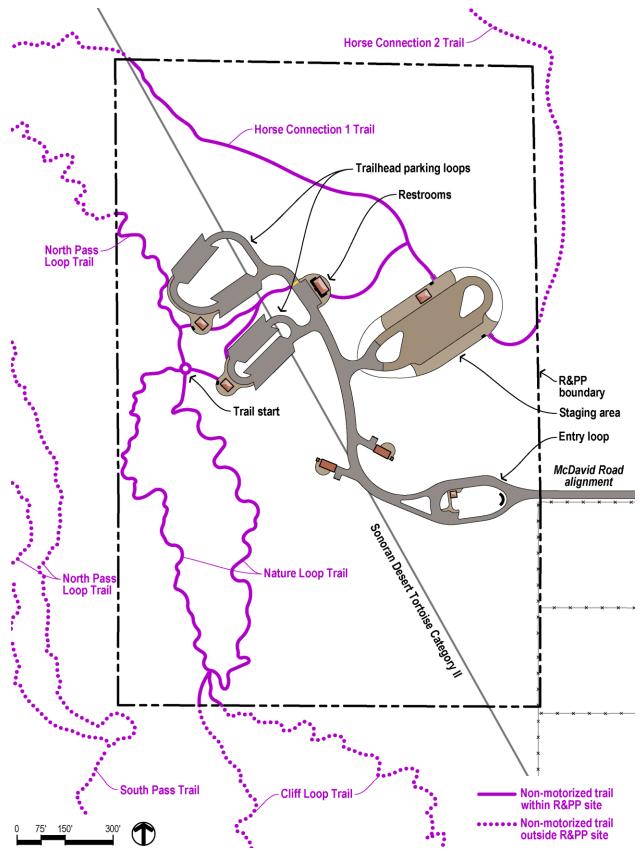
Trails at the McDavid Road Trailhead and Staging Area
